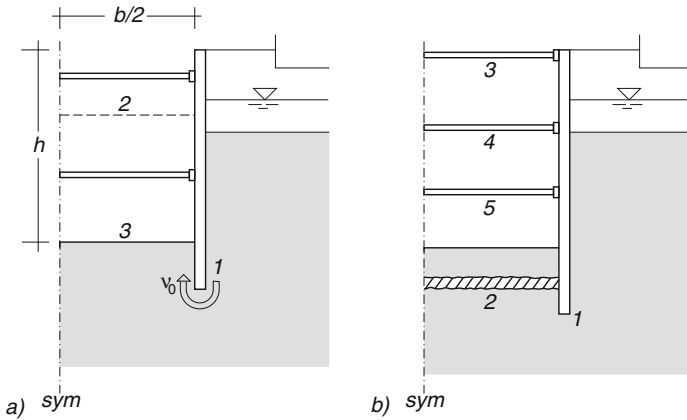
Struttred walls in soft ground with open excavation base (a) and grouted slab (b)
